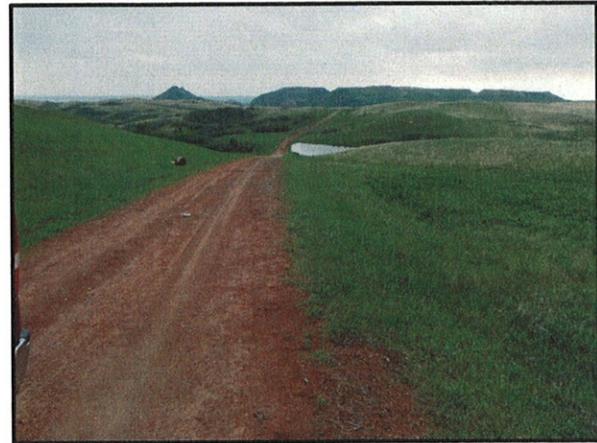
General view of Hale Marina Road looking south and at stockpond on west side of road.
